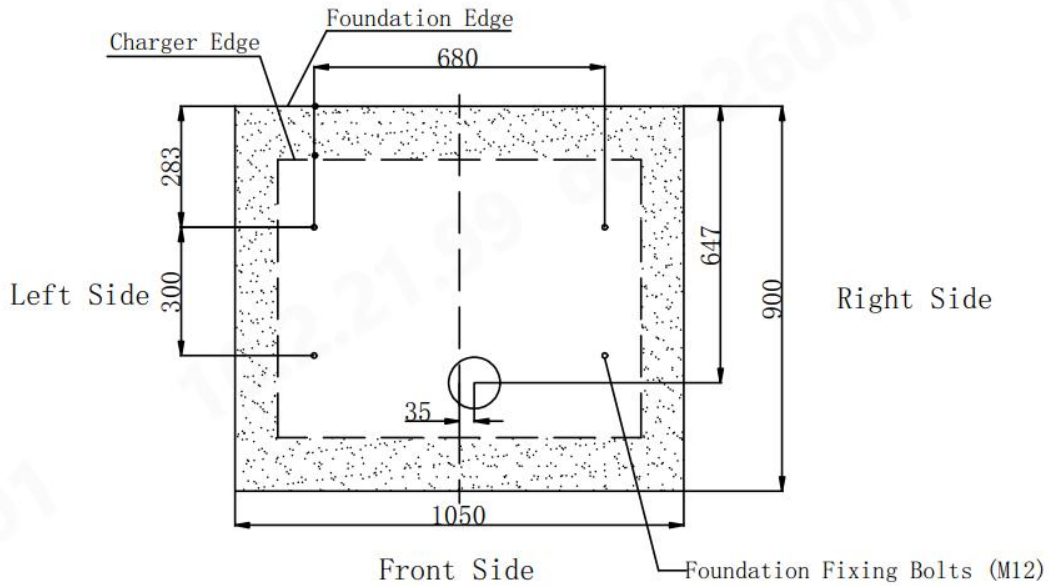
Diagram of Standard Foundation Dimension (unit: mm)--240kW
